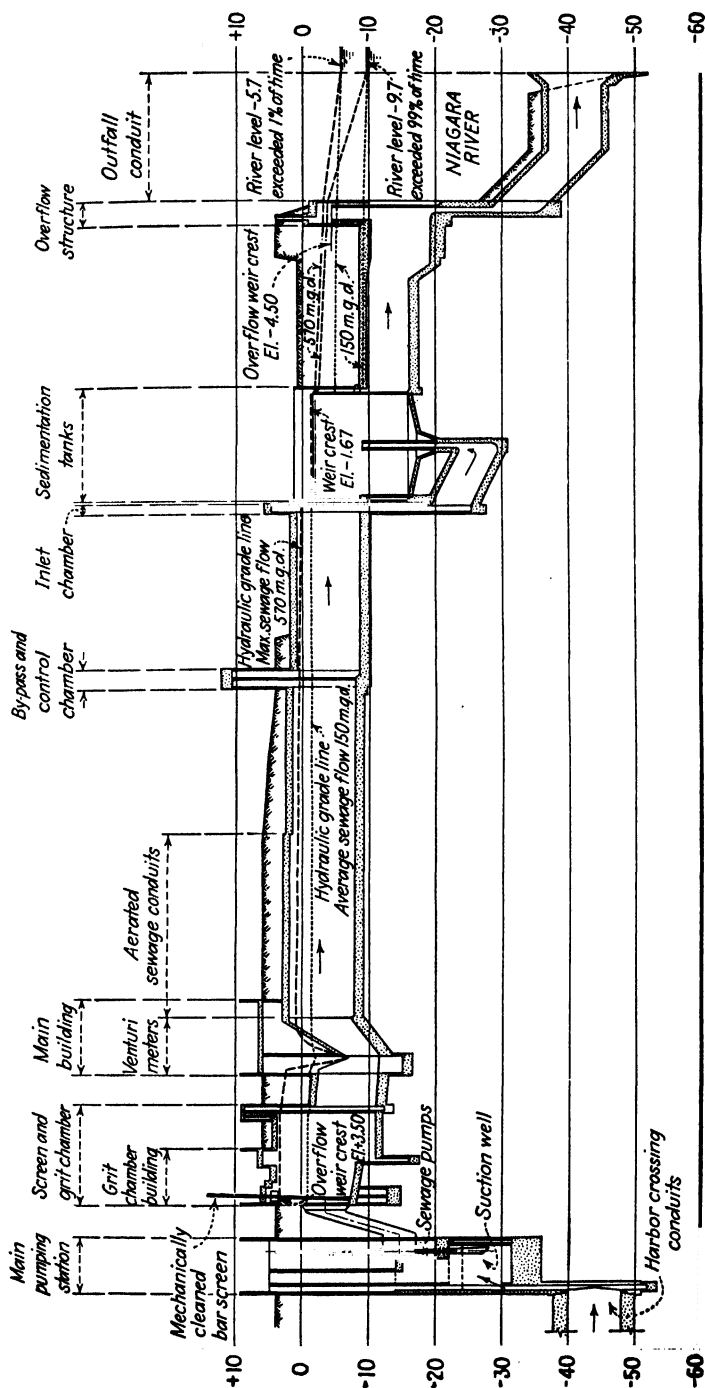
Sewage-treatment plant, hydraulic profile. Buffalo Sewage Authority, Buffalo, N. Y.
